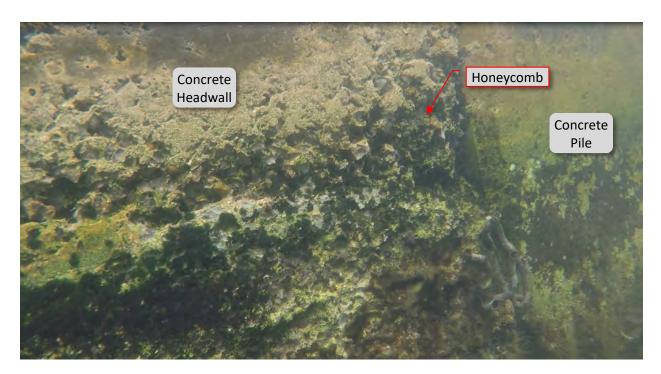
HW1. STA 2+49 - 2+50. Honeycomb area at culvert headwall.
